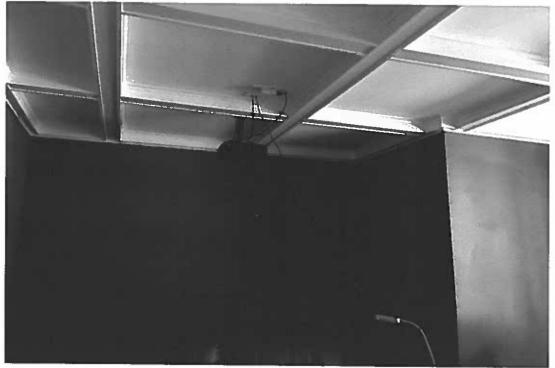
Inside Kitchen facing east. Door to outside is visible at the left side.
